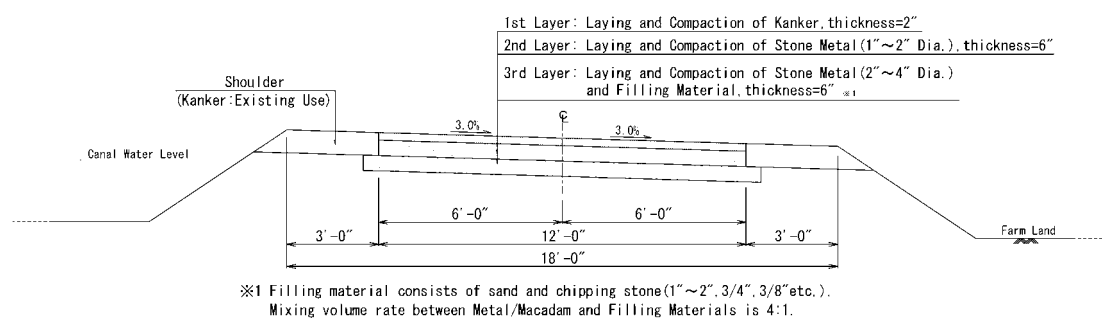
Typical Cross Section of Metal/ Macadam Pavement (Canal Inspection Road)
